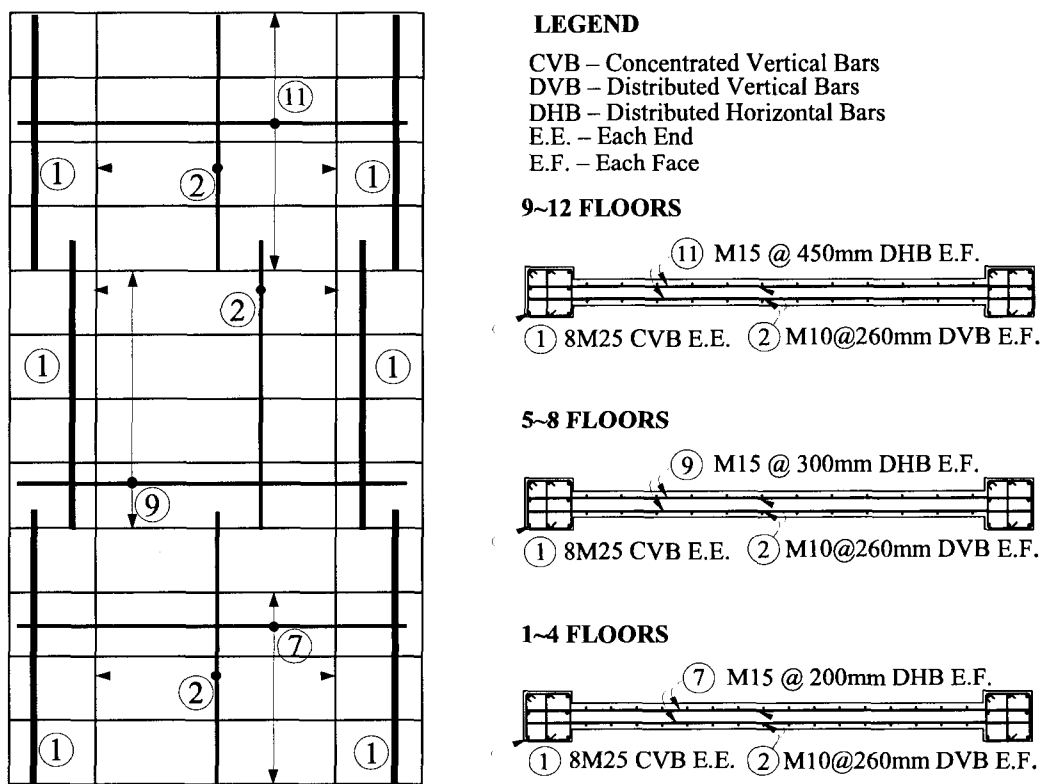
Shear wall reinforcement in B12 building located in Montréal.
